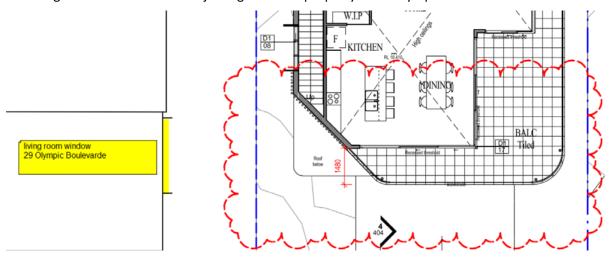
Plan of modified first floor plan in relation to living room window of adjoining northern property at 29 Olympic Boulevarde
